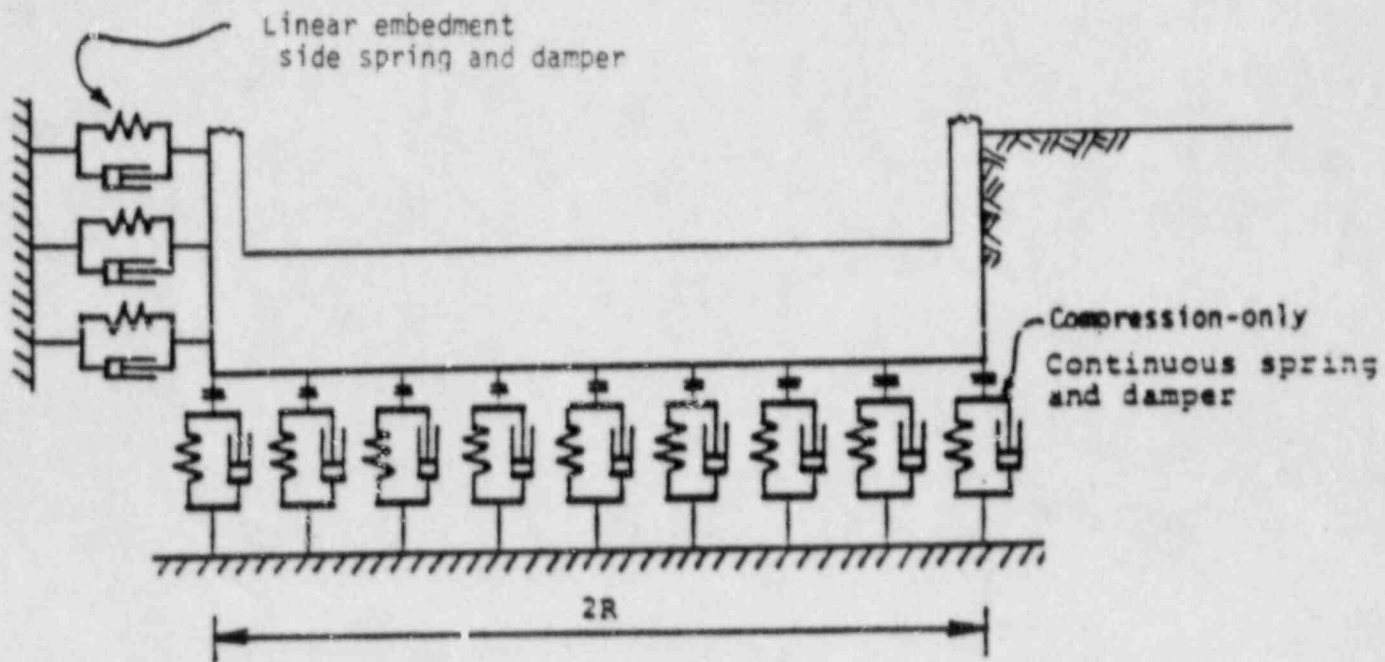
Winkler Foundation Model for Surface-Supported Basemat
